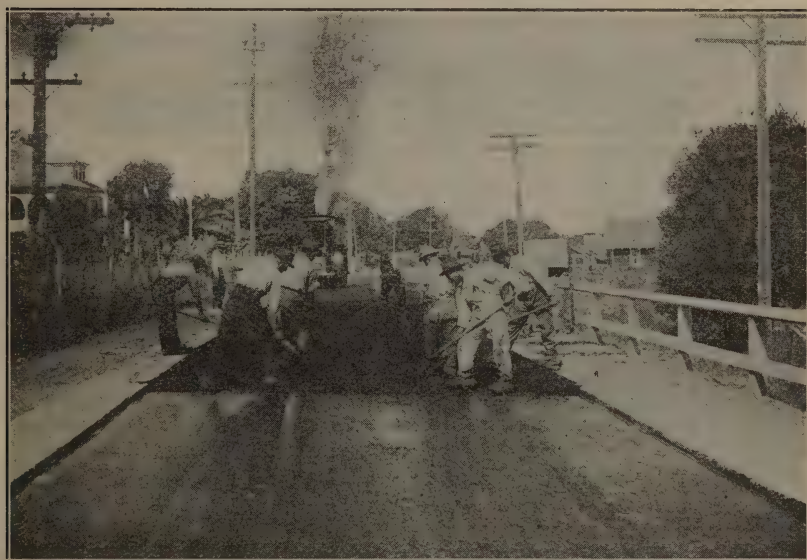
Plate XII. State Highway, Sonoma County, laying asphalt between concrete shoulders.
